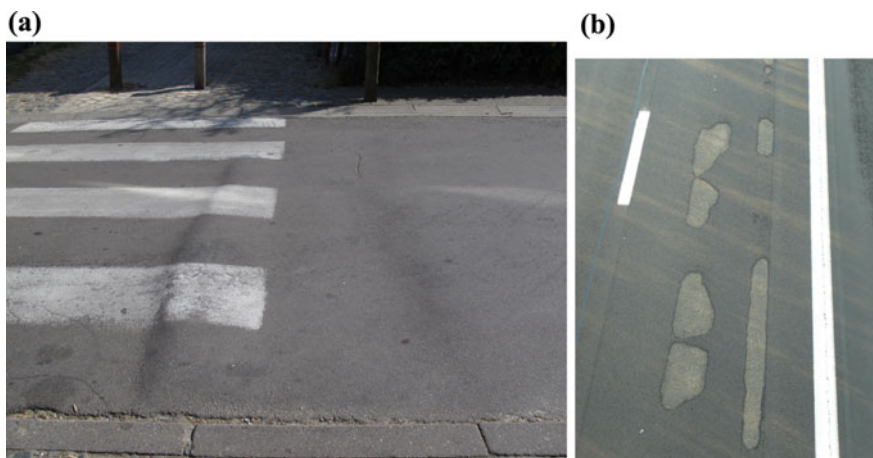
Pavements damages in Belgium a Corrugation in asphalt pavement b Peeling in composite pavement
